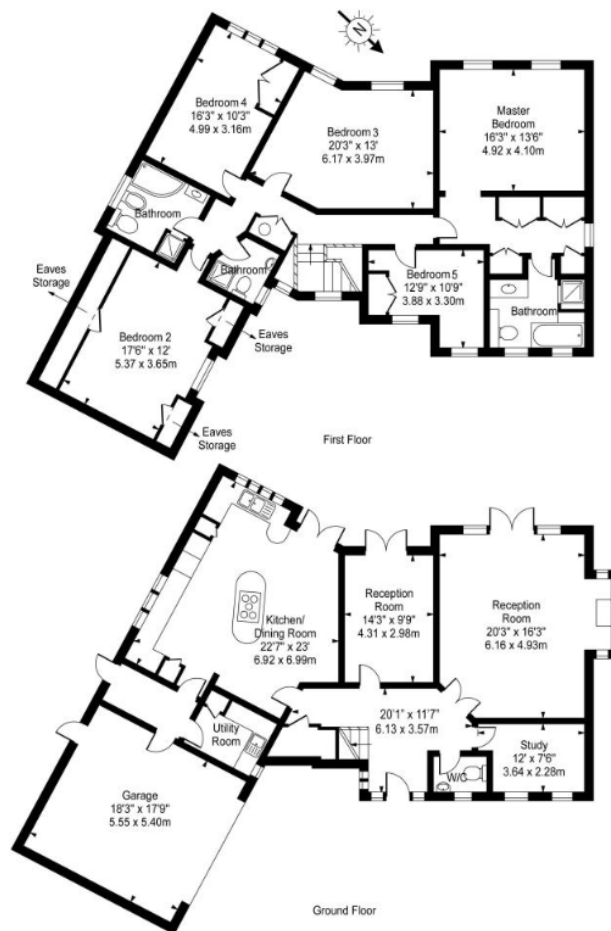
18a Ducks Hill Road Floor Plans from Rightmove
